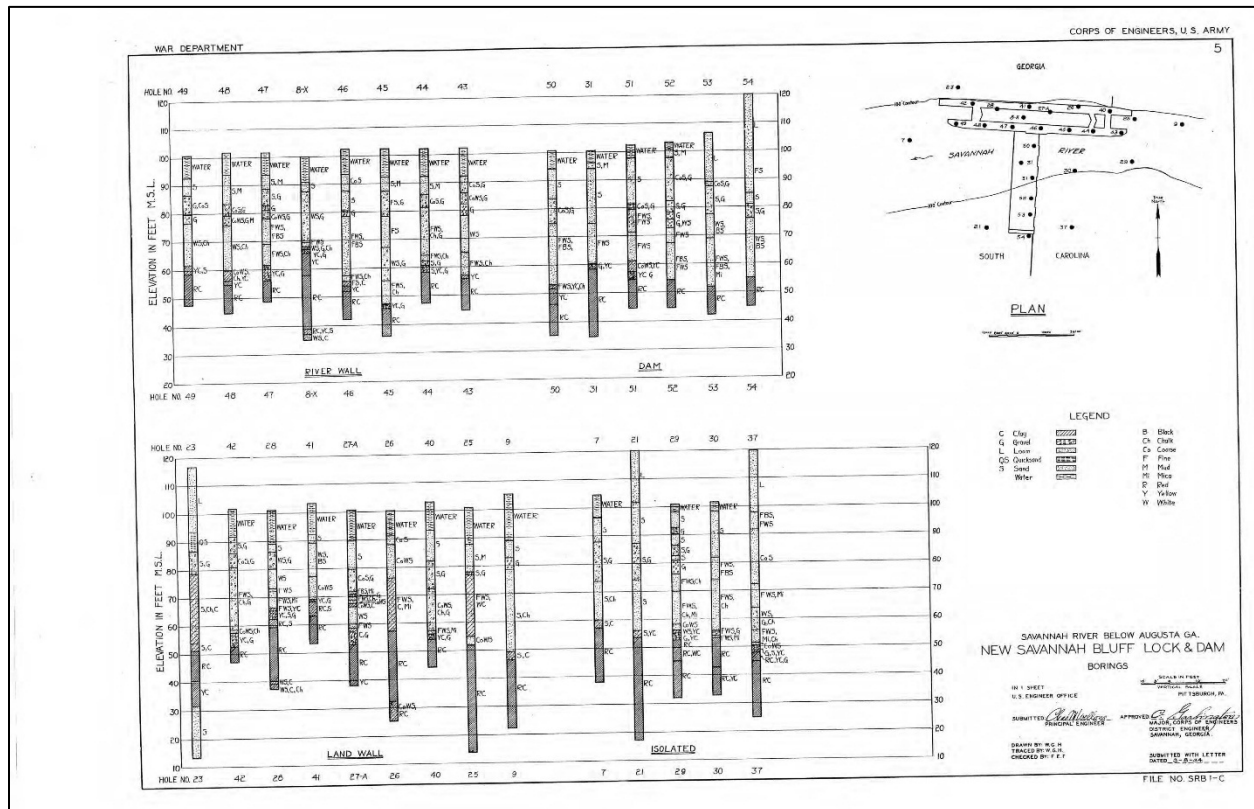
New Savannah Bluff Lock and Dam Borings (1934)
